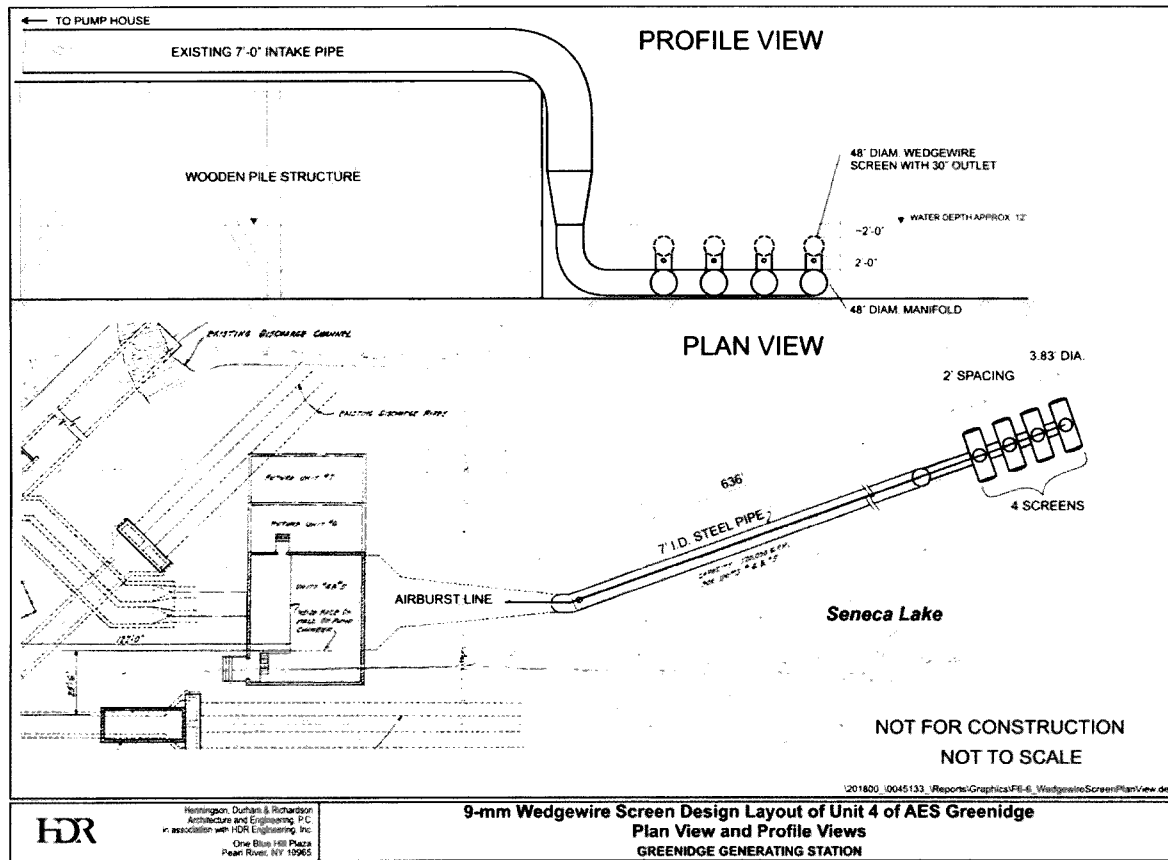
Unit 4 Wedge-wire Screen Design Layout Plan and Profile Views
